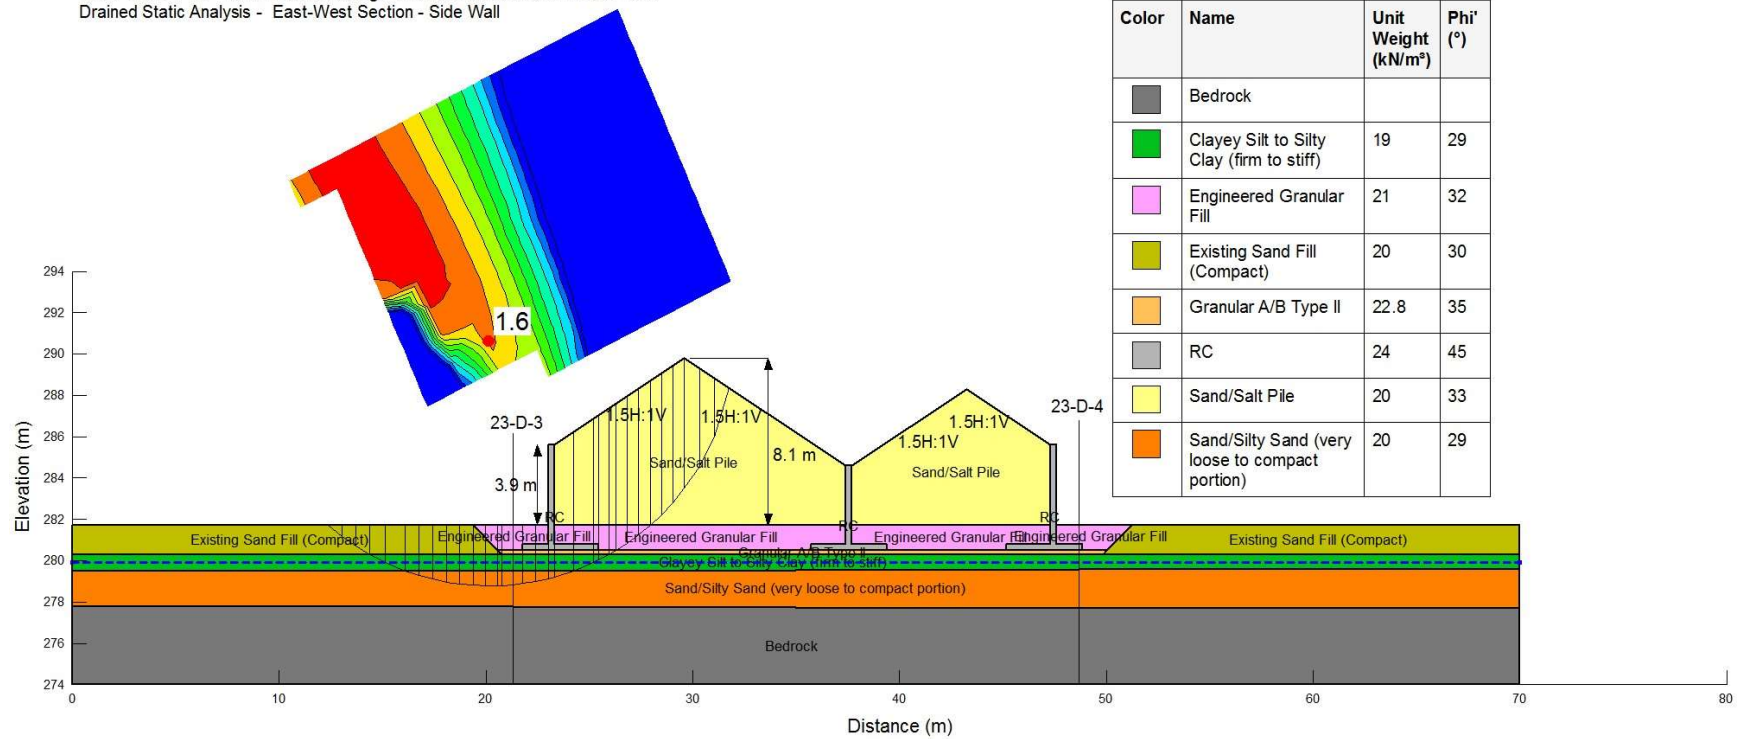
Slope stability analysis of new material storage building – E-W section, west side wall – drained static analysis
